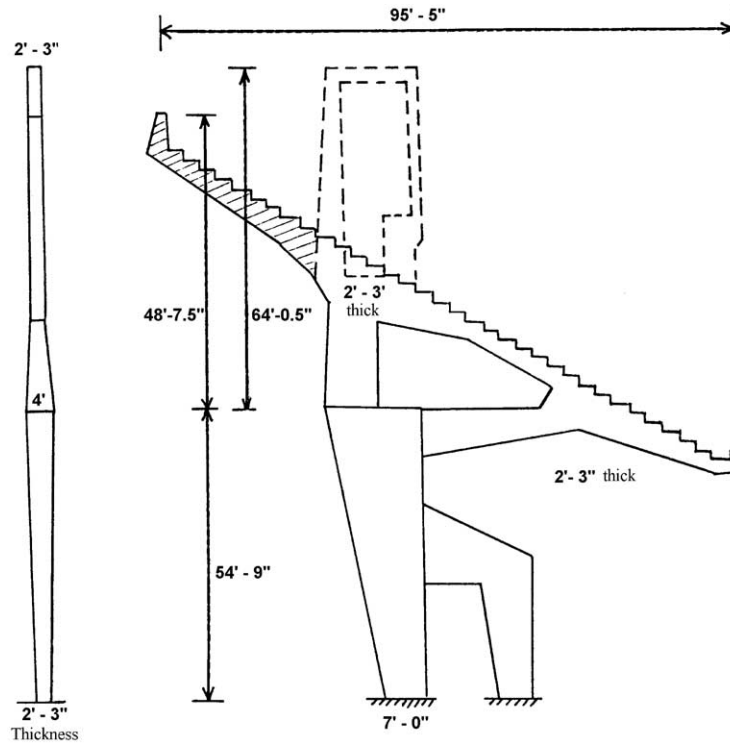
Typical reinforced concrete frames supporting upper deck of U.W. Stadium.
